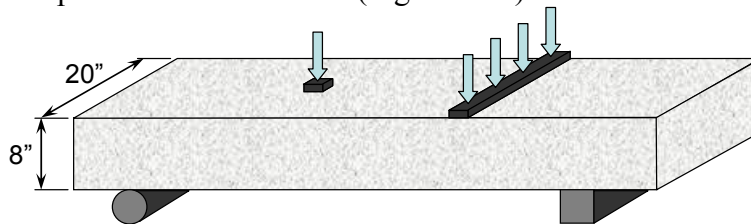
Detail of Leonhardt and Walter (1961) and Furuuchi et al. (1998) test specimens.
